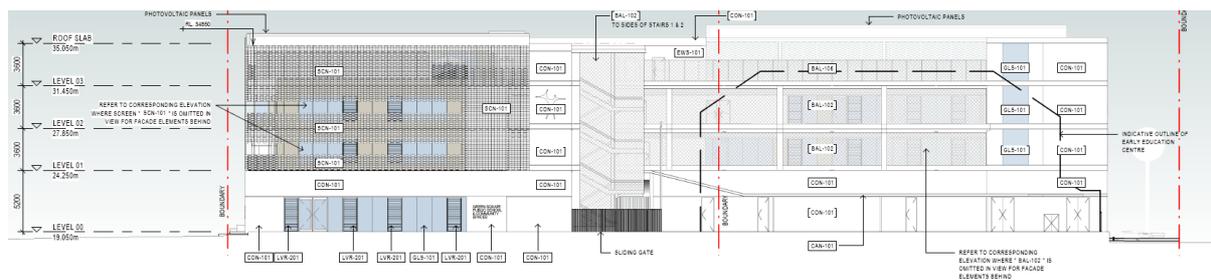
| South Elevation with Flexi-Brick screen (Source: BVN)
